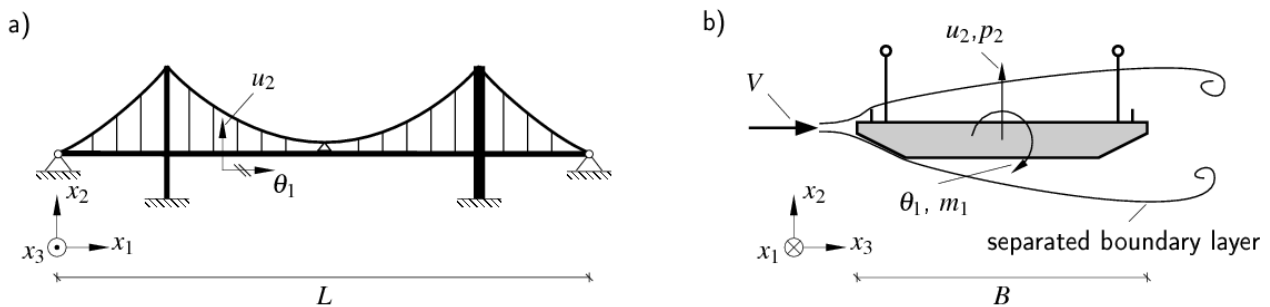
Definition of notation. a) Principle structural setup of a suspension bridge. b) Cross section of bridge deck.
